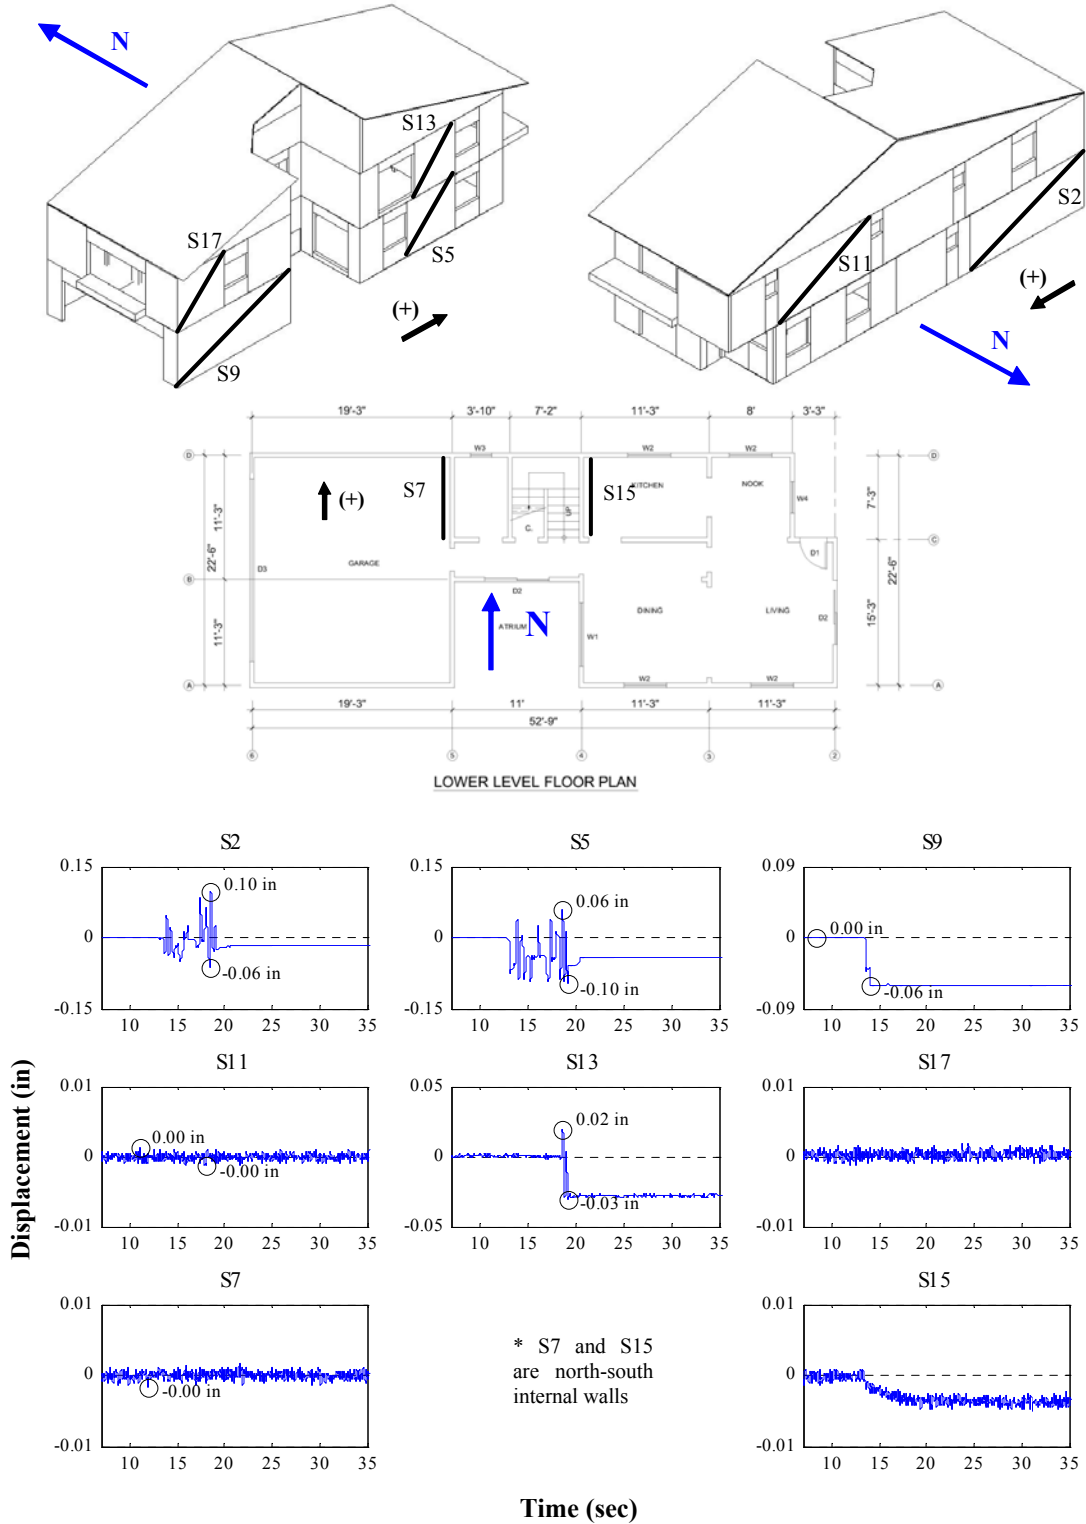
Wall deformations of east-west internal walls for Test NWP2S24
